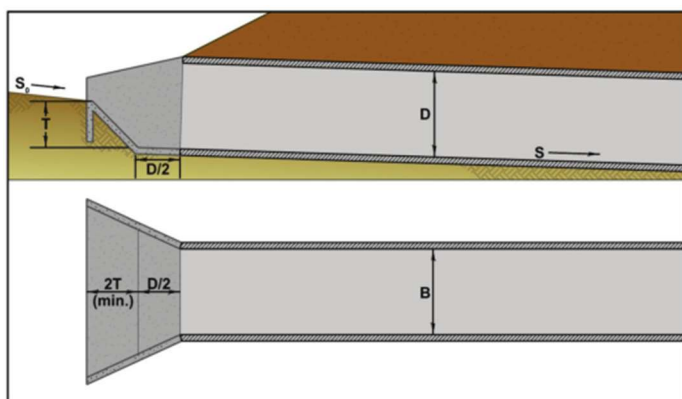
Culvert with inlet depression and with apron and wingwalls.
